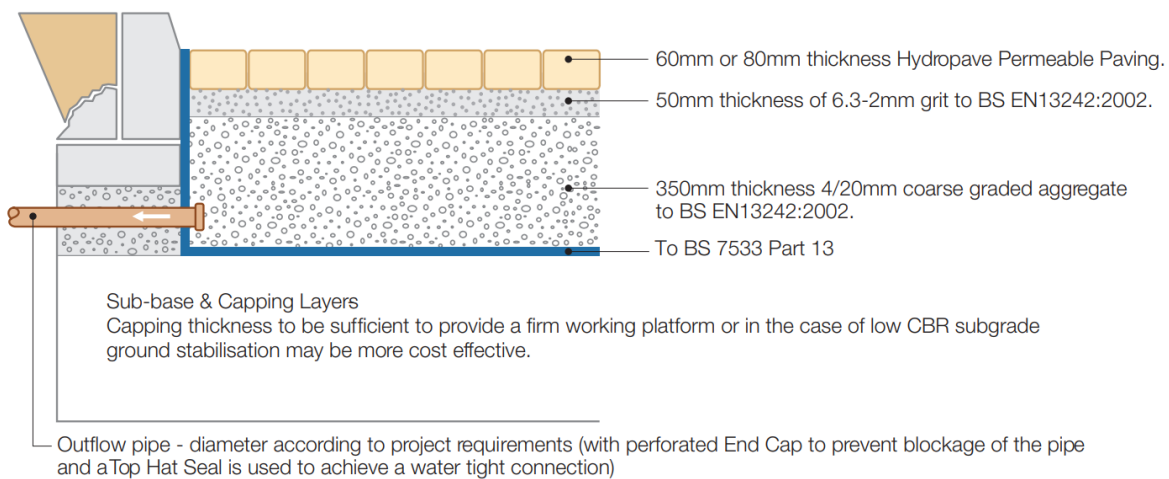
Typical Section Through Permeable Paving in Parking Spaces
